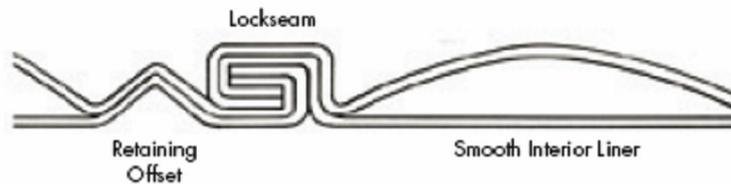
Section Through Steel Lined Corrugated Metal Pipe (Source: Contech Construction Products)
